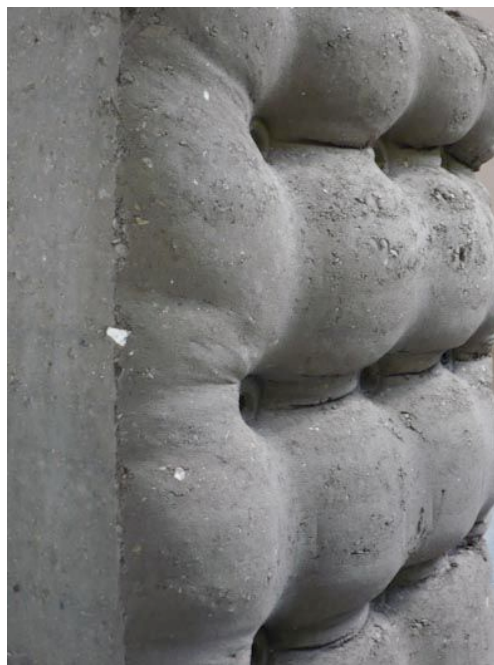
Detail of earth wall without bracing 2008, image A. Chandler
